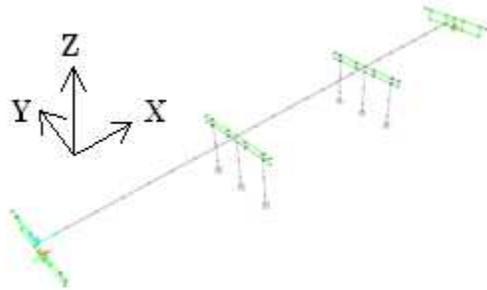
Three-span simply-supported bridge model in SAP2000.
